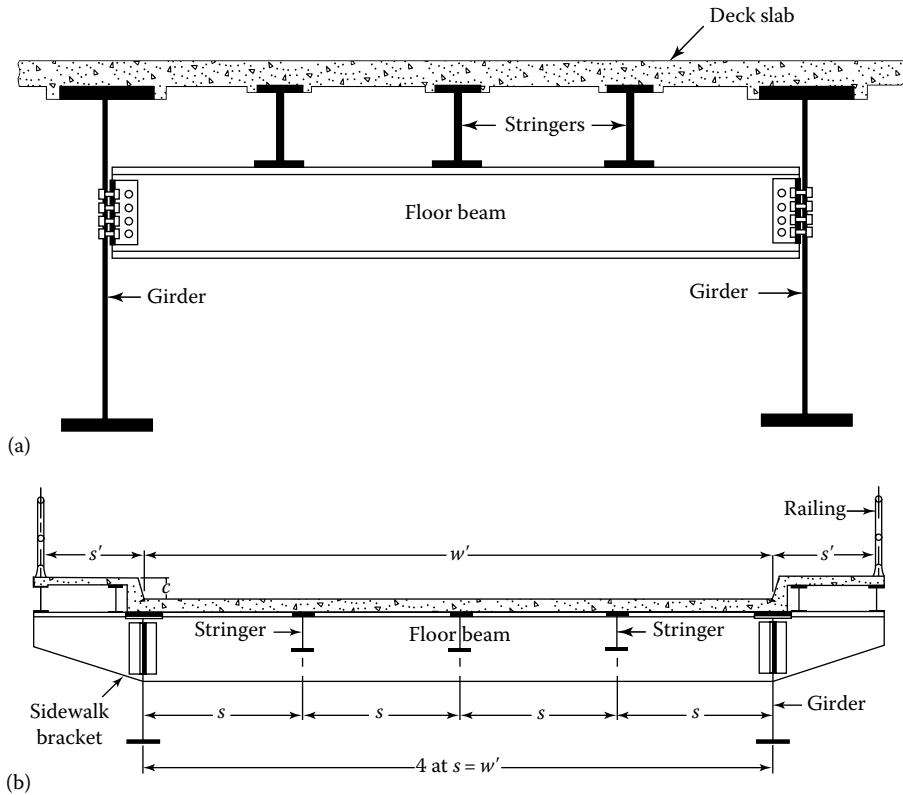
Examples of position of concrete deck in long-span slab-steel plate girder bridges. The deck is supported over the steel stringers—(a) the stringers are supported on the top of a transverse steel floor beam that is framed into longitudinal plate girders, and (b) stringers are framed into the transverse floor beams. In both cases, the primary reinforcement in the deck is *perpendicular* to traffic.
